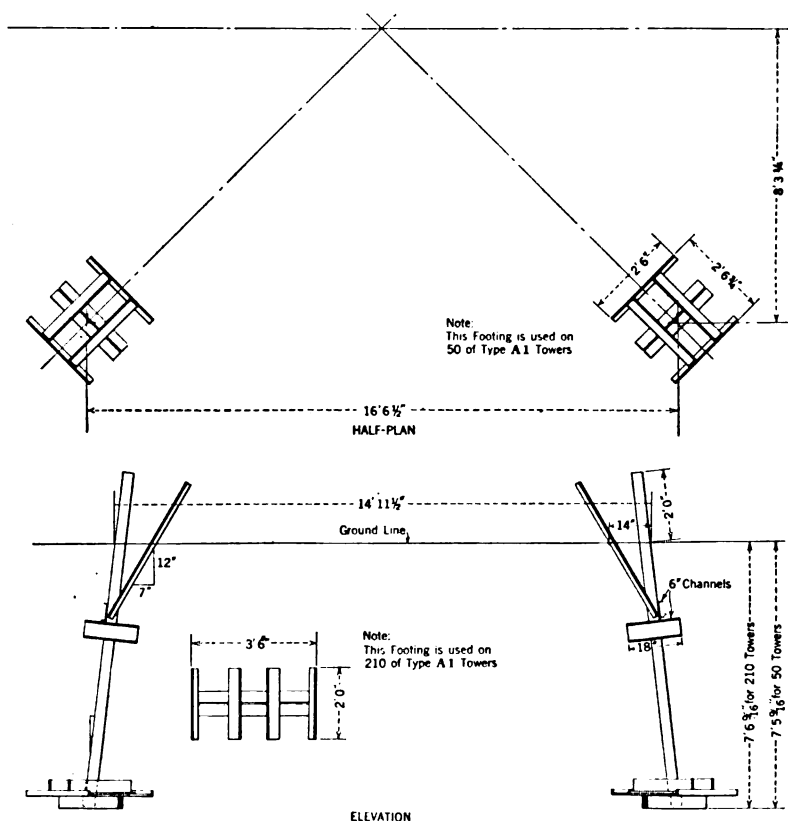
FOOTING USED ON 50 TYPE "A1" TOWERS
